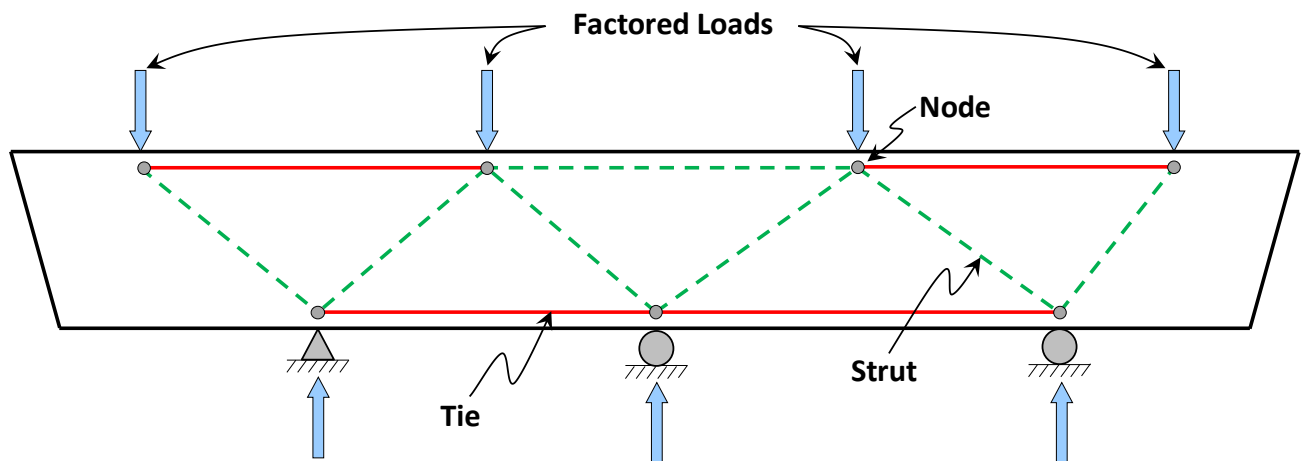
Strut-and-Tie Model for a Beam (adapted from Williams et al., 2012)
